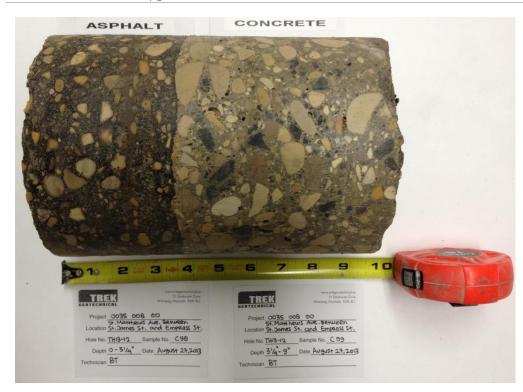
Asphalt and Concrete Core Sample from Test Hole TH13-12
